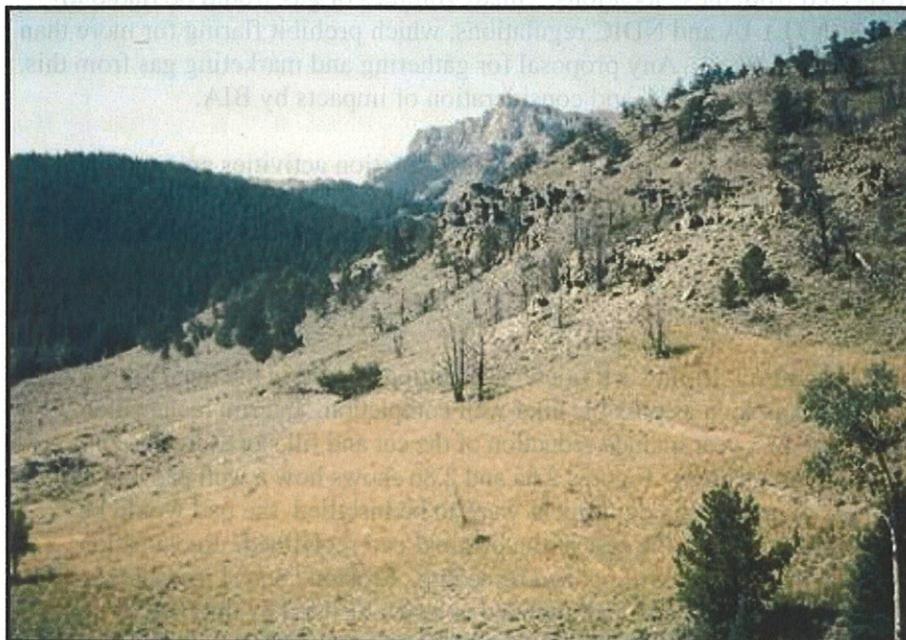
The well pad and access road were reclaimed by returning the land to its original contours, spreading the topsoil, and revegetating the site (USDI-USDA 2007).
